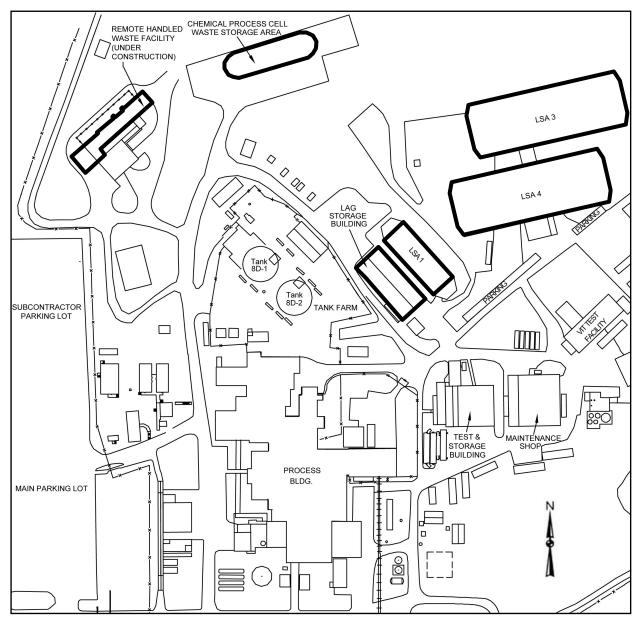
Lag Storage Building, Lag Storage Additions, Chemical Process Cell Waste Storage Area, and Remote Handled Waste Facility
